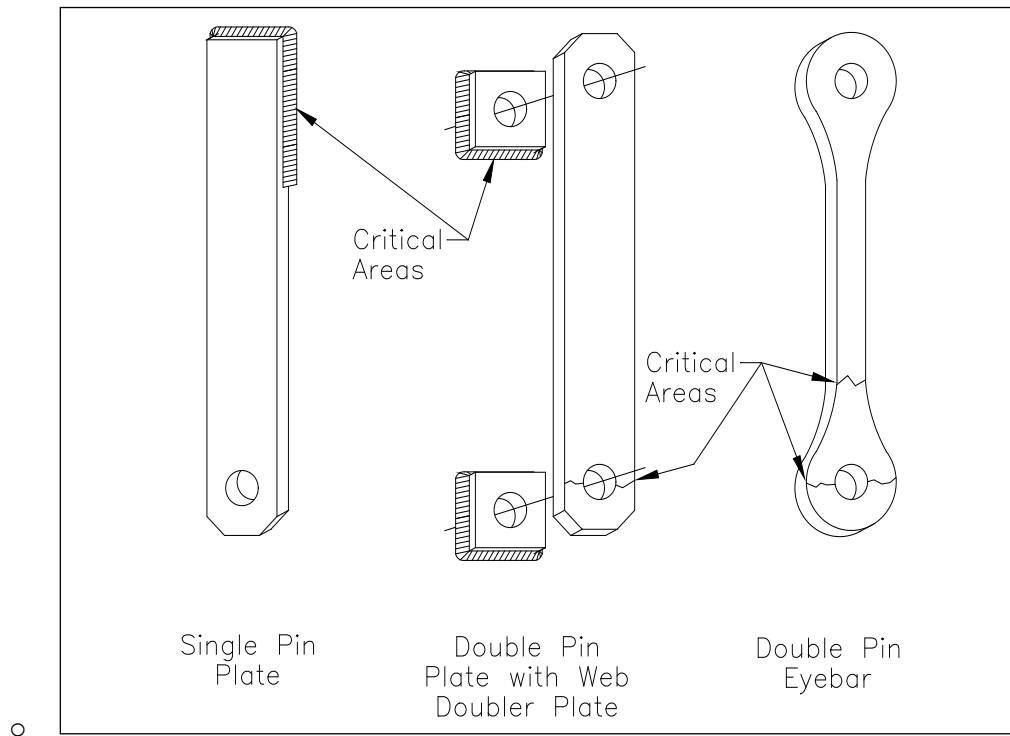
Fatigue Cracks in Pin and Hanger Assemblies
